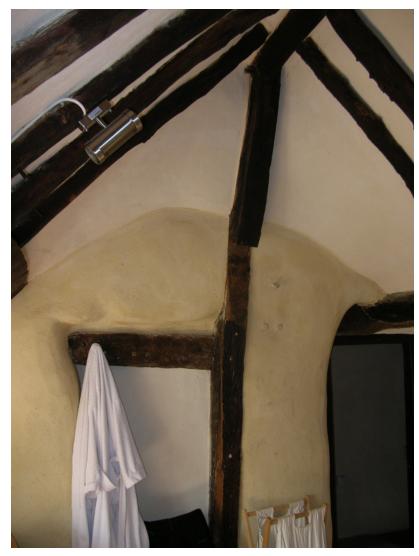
East facing wall of the main bedroom showing two lapped vertical timbers supporting the ridge pole, and a blocked doorway, from the south-east
